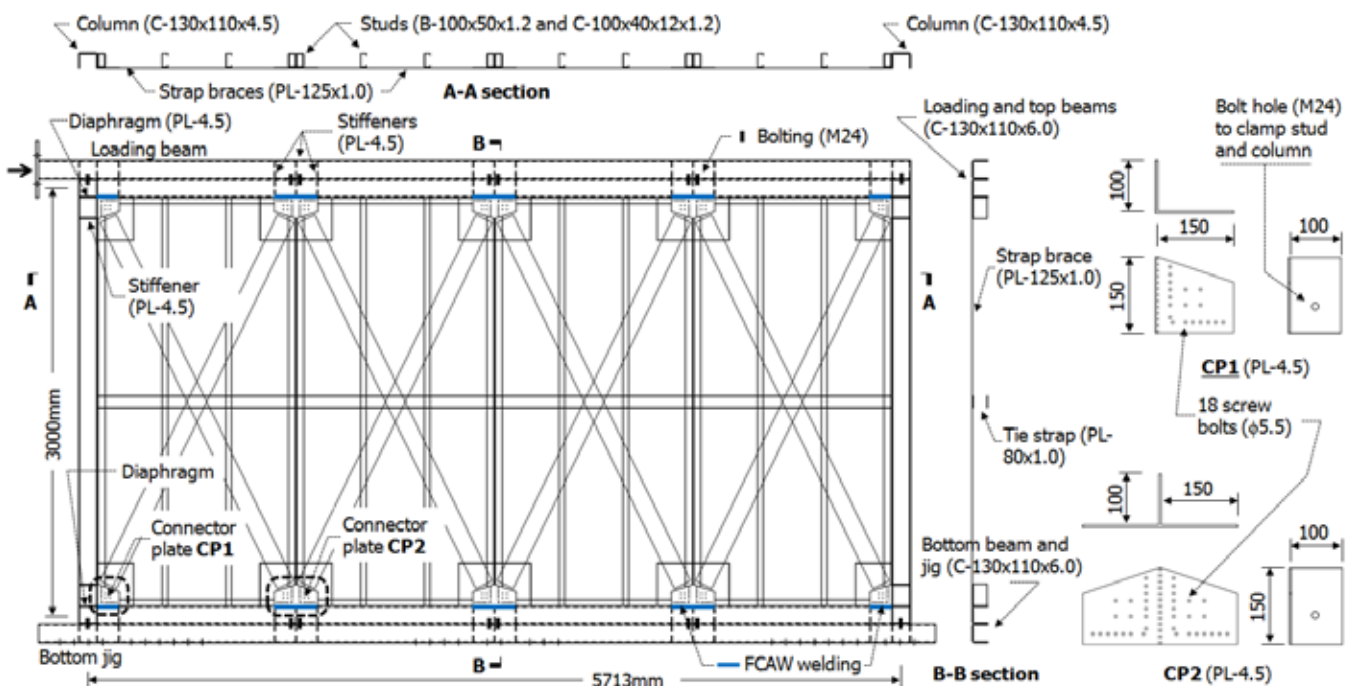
Configurations and details of modular building unit SDS using strap-braced stud panel (mm)
